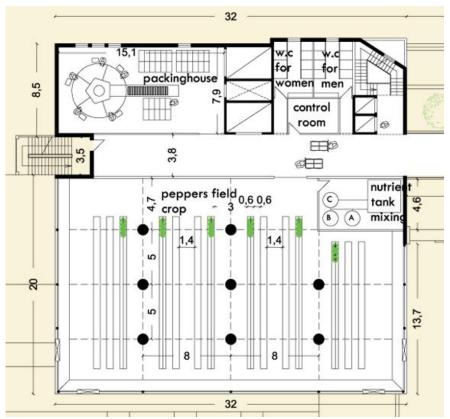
Typical floor plan showing tomatoes, pepper, and watermelon field arrangement
